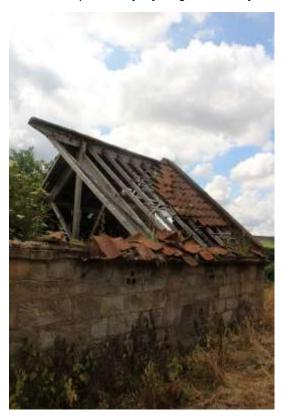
Oblique view SSW of N-facing elevation of Building No. 2
